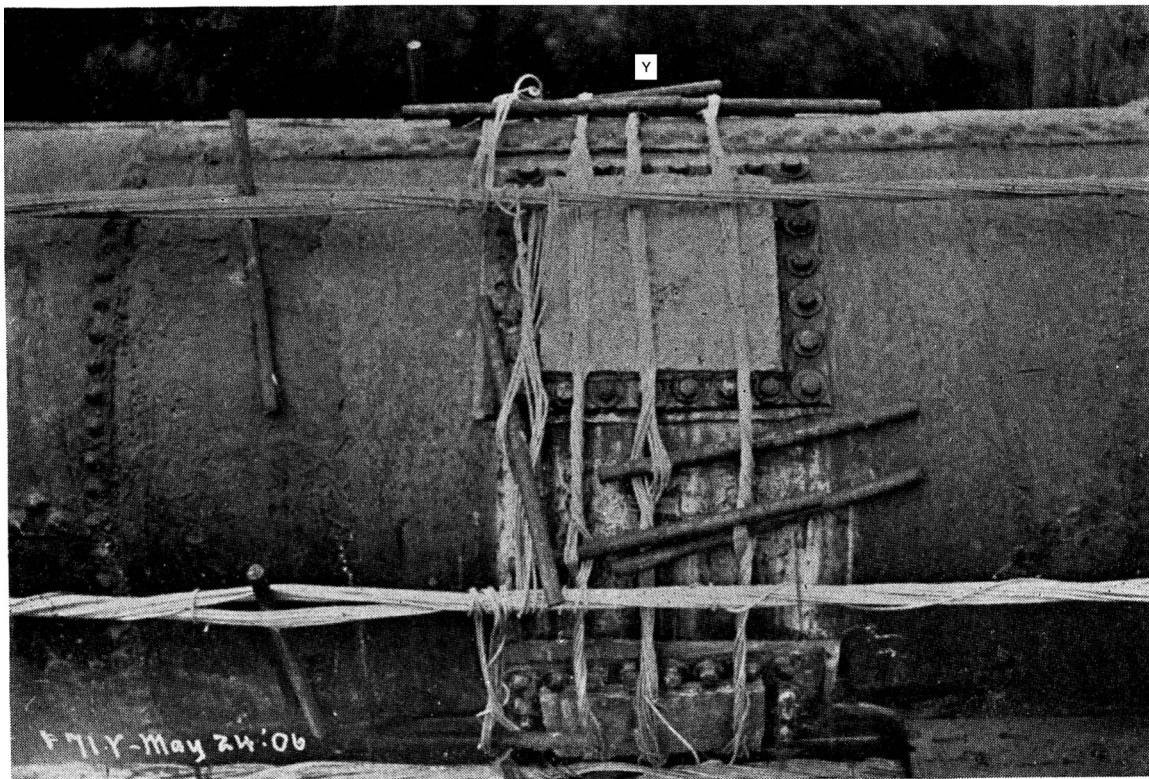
San Andreas Pipe Repair at Colma Creek Crossing (Credit: Schussler 1906 HS25)
